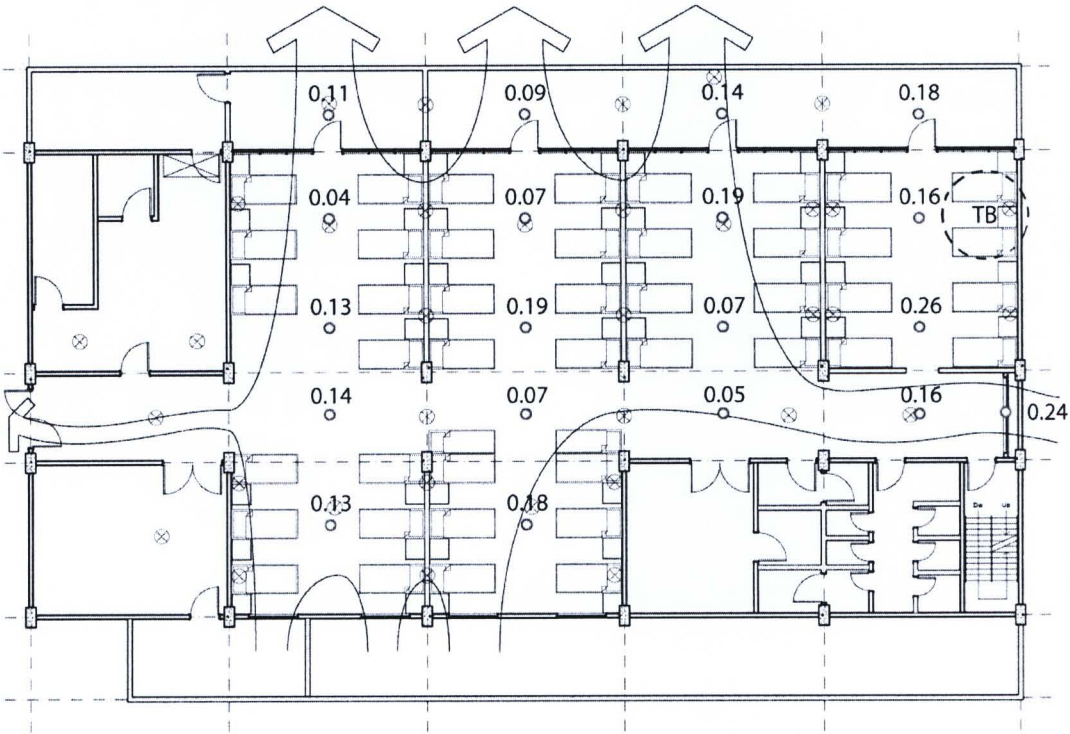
Floor plan and ventilation data of hospital D inpatient ward#1
